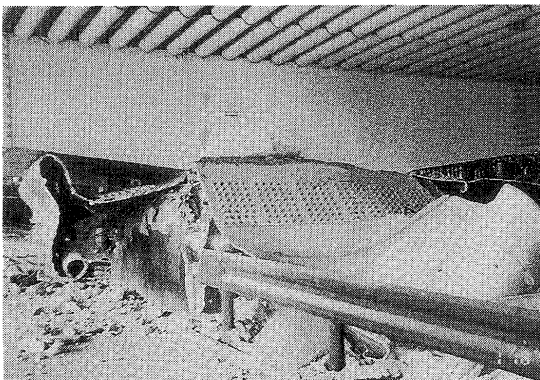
Collapse of steel pier.<sup>6)</sup>
